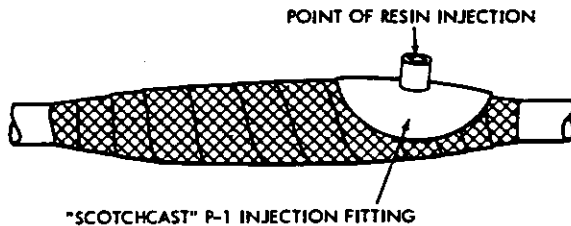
Pressure Splice, Locating Injection Fitting.
